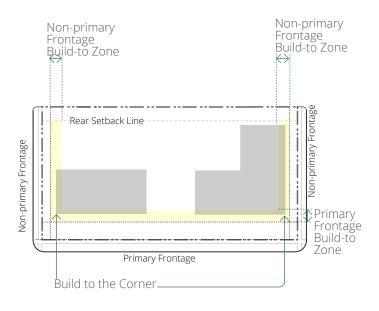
B-1. Build-to Corner and Build-to Zones
